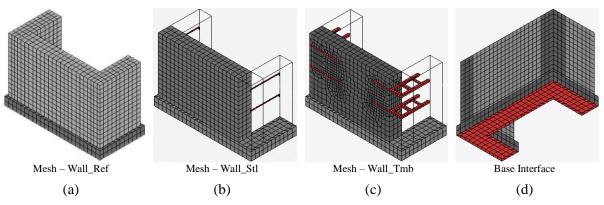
Detailing on the finite element mesh: Reference model Wall 0 (a) Wall 1(b) and Wall 2 (c);
